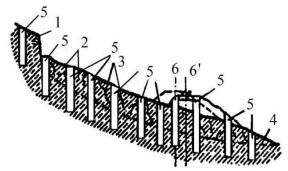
Diagram of embankment stabilization by soil reinforcement: 1 – break edge; 2 – landslide mass; 3 – cracks in the landslide; 4 – landslide sliding surface; 5 – reinforced soil columns; 6 – road axis before shift; 6' – the same after shifting
